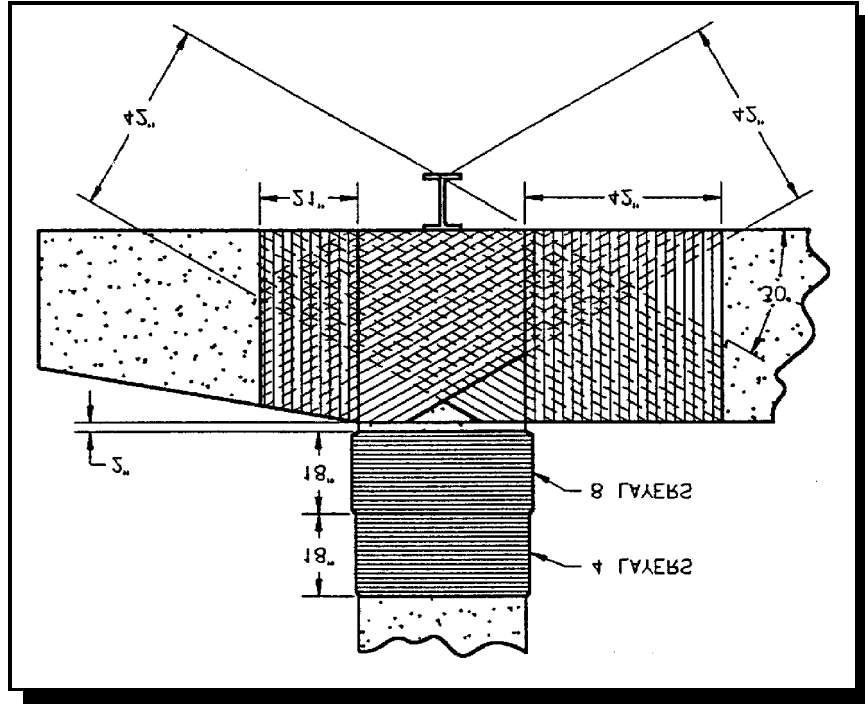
Test #3: Design for 30° composite wraps (Scale 1:50).
